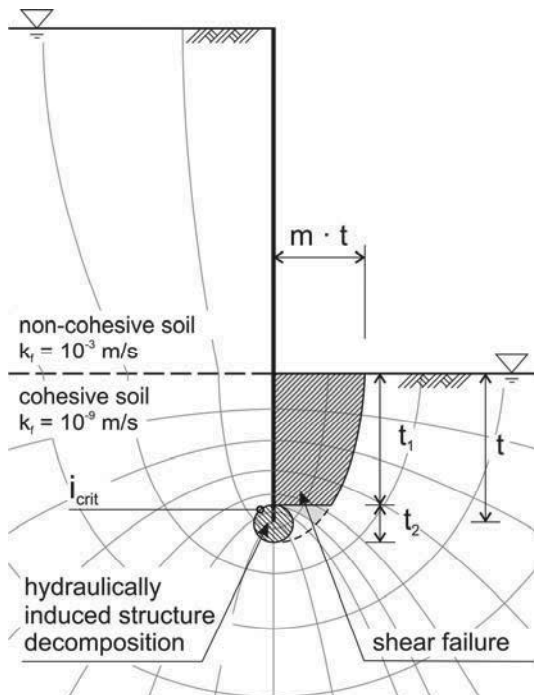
Areas of dominant shear failure and hydraulic induced structure loss at a flow around pit wall
